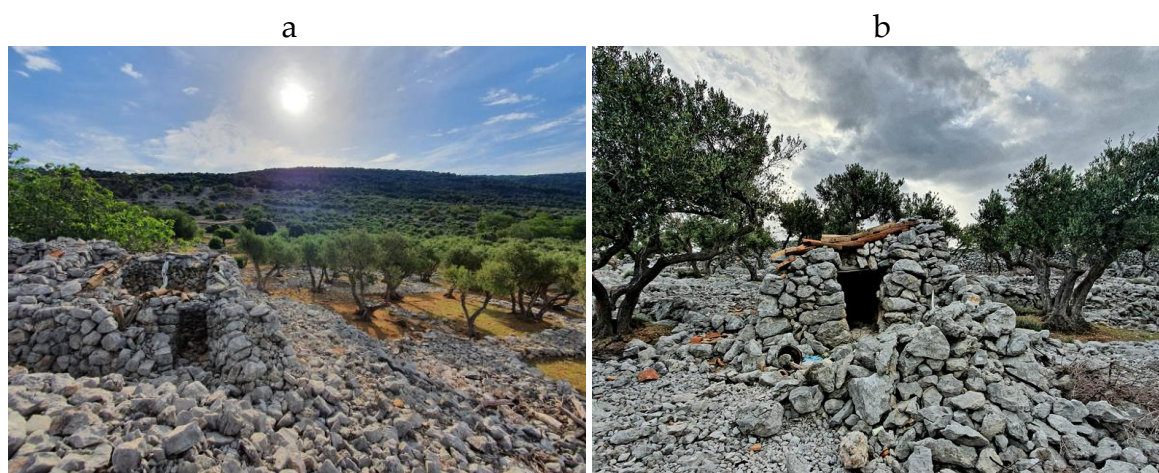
a-b) The predominant type of field huts found on the Cres-Lošinj archipelago with a square ground plan located on the clearance wall, with a mono-pitch roof made from tiles (2020).
